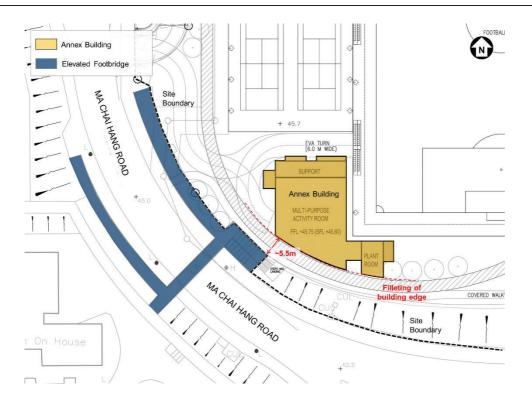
Layout Plan of Annex Building at Ground Floor Level under <u>Approved S16</u>
